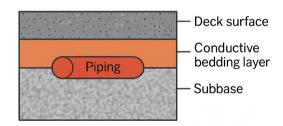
Cross-sectional schematic of hydronic piping thermally coupled to a bridge deck via a conductive bedding layer.
